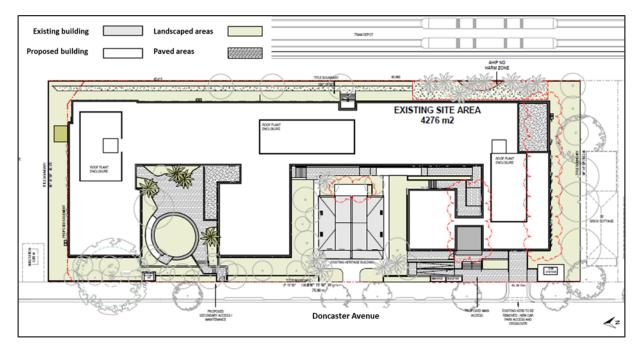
| Proposed roof plan and landscaping layout layout (Source: Applicant's RRFI)
